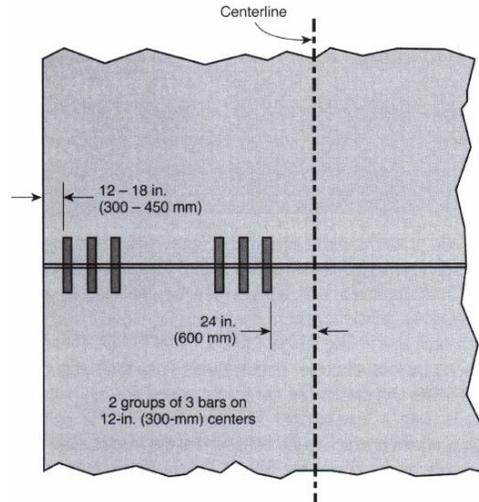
Recommended location of dowel bar retrofits (ACPA 2006a)
